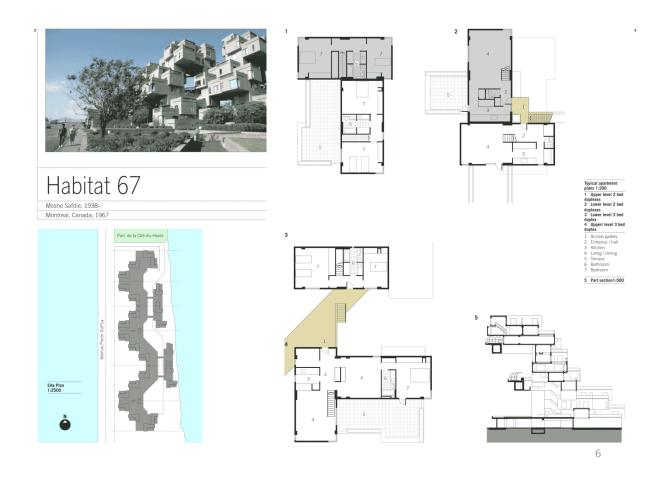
Extract from Key Urban Housing of the Twentieth Century: Plans sections and elevations Laurence King (UK) Norton (USA) 2009. Chapter 4 Alternatives, page 134.
